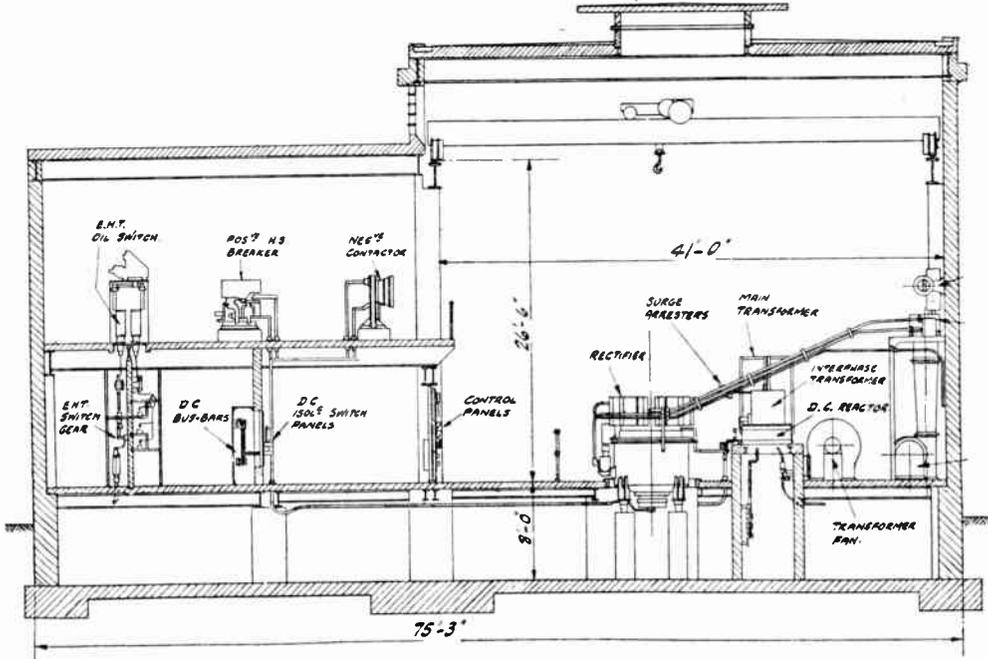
SECTIONAL ELEVATION SHOWING GENERAL ARRANGEMENT OF SUBSTATIONS.
